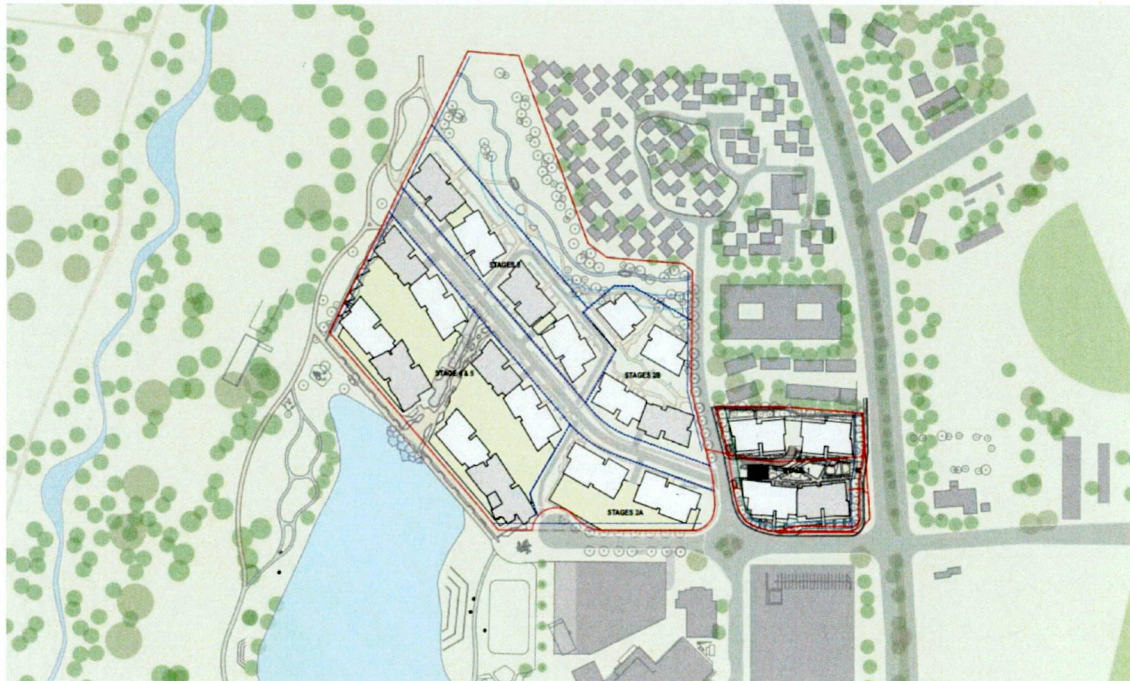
Excerpt of Site Plan lodged with DA 17/0766 showing St. 1 and remainder of proposed ESQ 1818 development on Lot 10 DP 1223020
